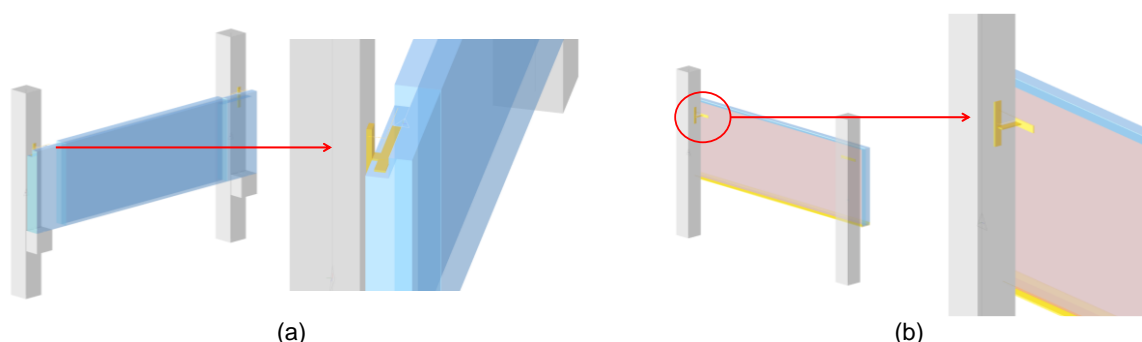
Schemes of connection between horizontal panel and columns: (a) example with anchor channel embedded on the top surface of the panel and (b) example with anchor channel embedded on the back side of the panel
